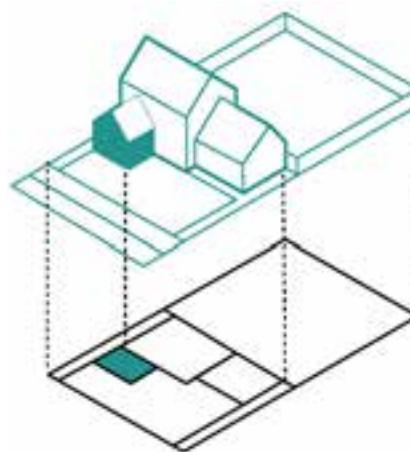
An acceptable example of a front extension which is smaller in scale than the existing building, mirrors the roof pitch, and covers less than 50% of the front elevation.
